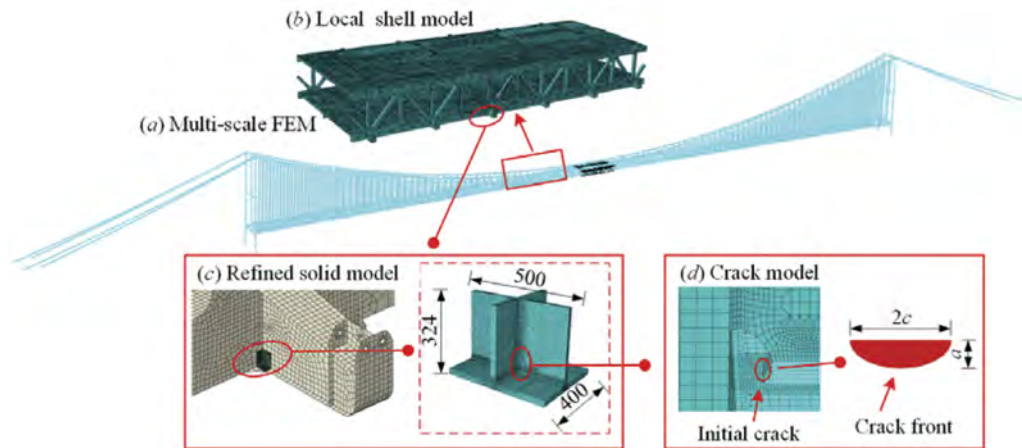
Multi-scale FEM of the suspension bridge (Unit: mm).
